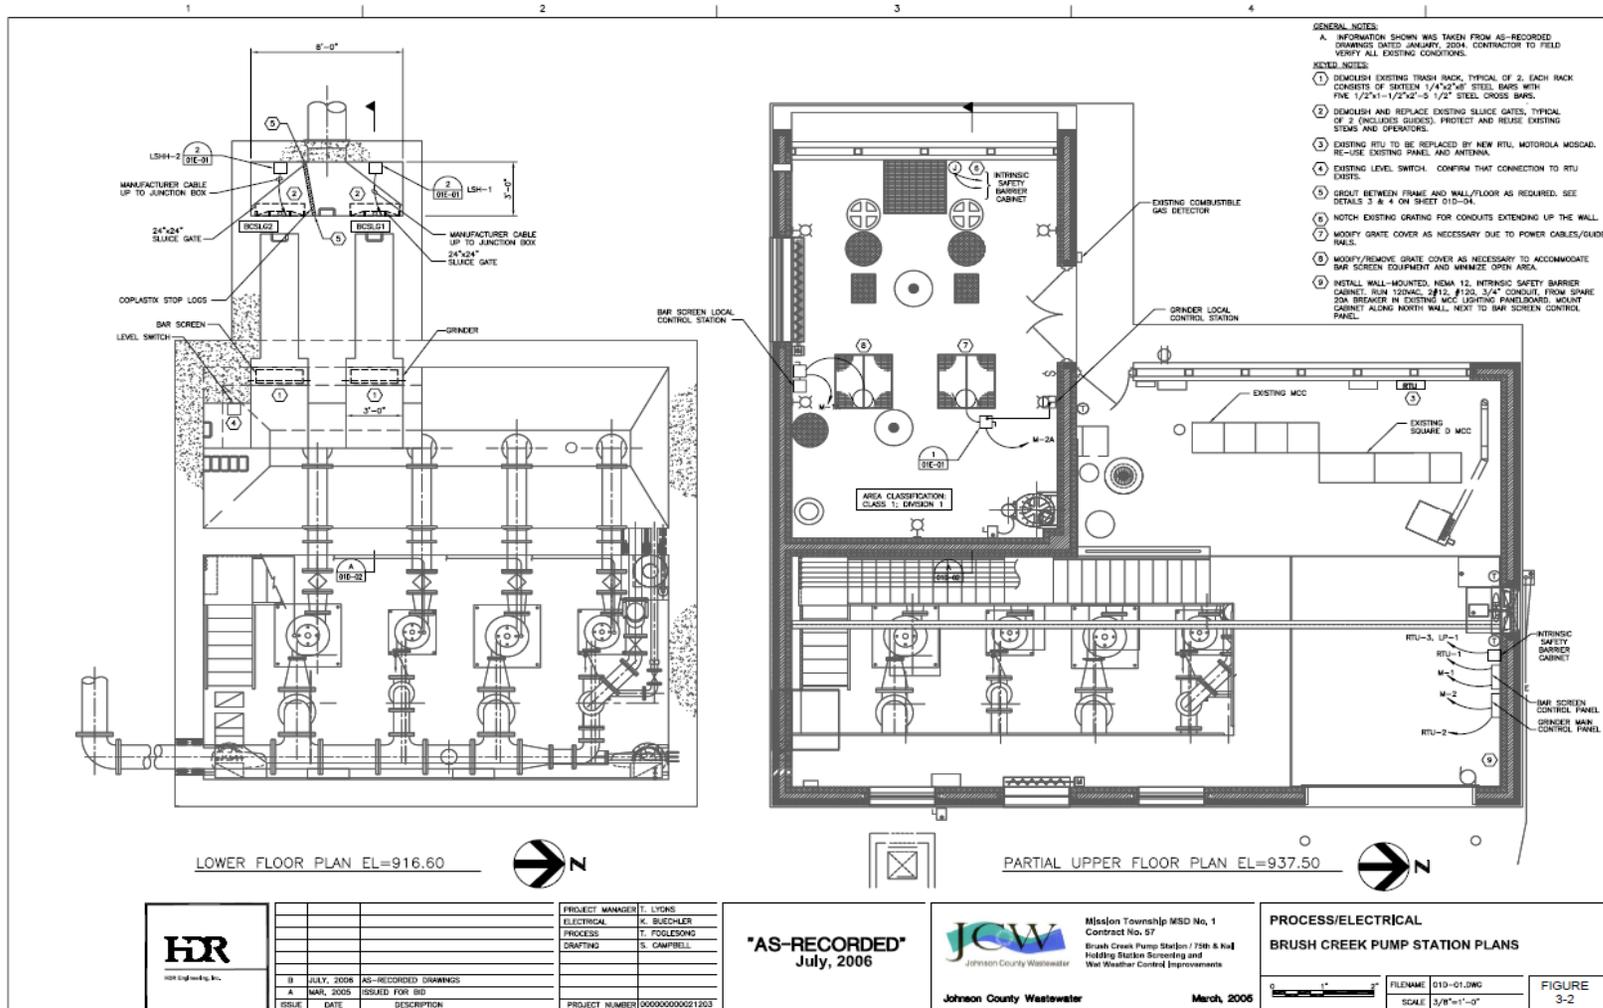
Existing Brush Creek Pump Station Floorplan
